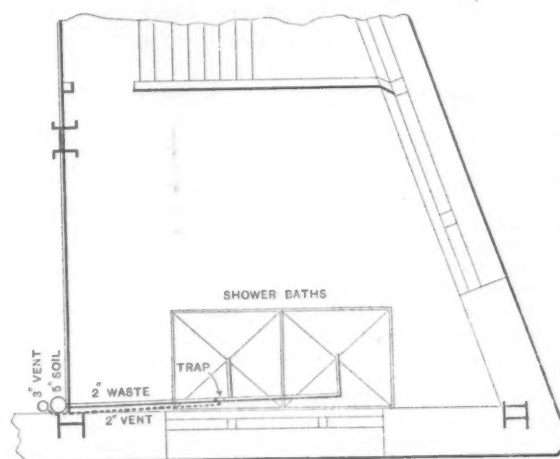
Plan of Shower Bath and Locker Rooms.
